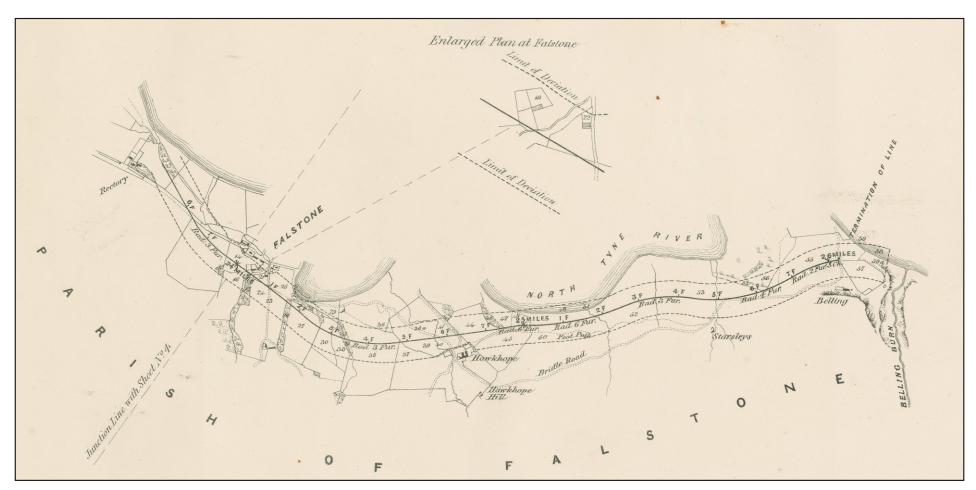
Plan of proposed North Tyne Section of the Border Counties Railway, 1853 (FAL_M&D 017)
